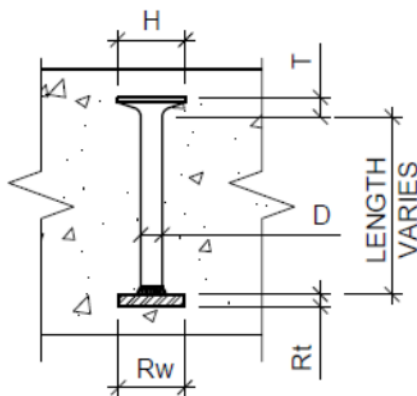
CCL SHEARTRACK<sup>®</sup> ASSEMBLY DETAILS
